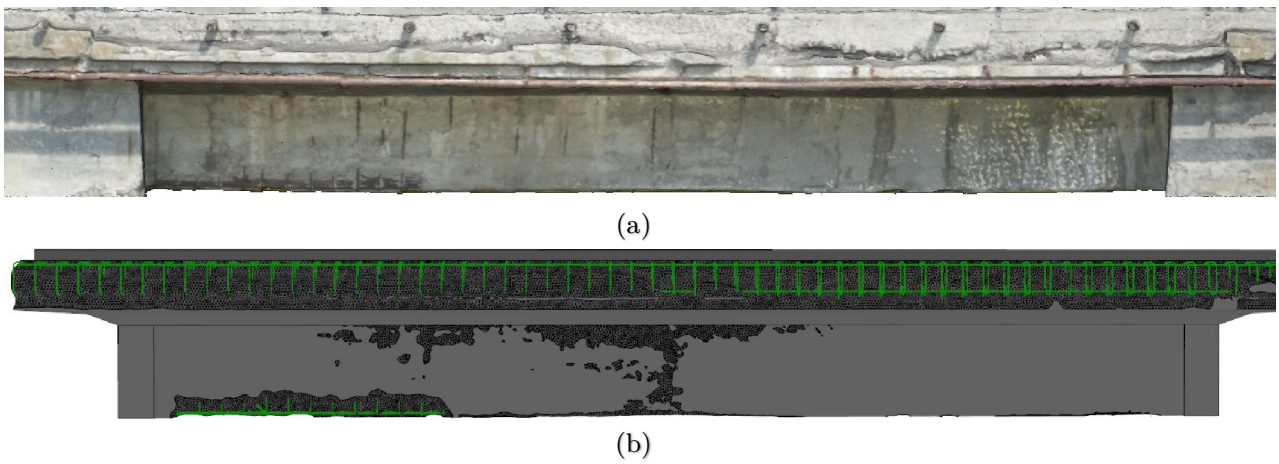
West girder and curb of the bridge: (a) photogrammetry-based triangular mesh, and (b) the as-is IFC with spalling damage geometry.
